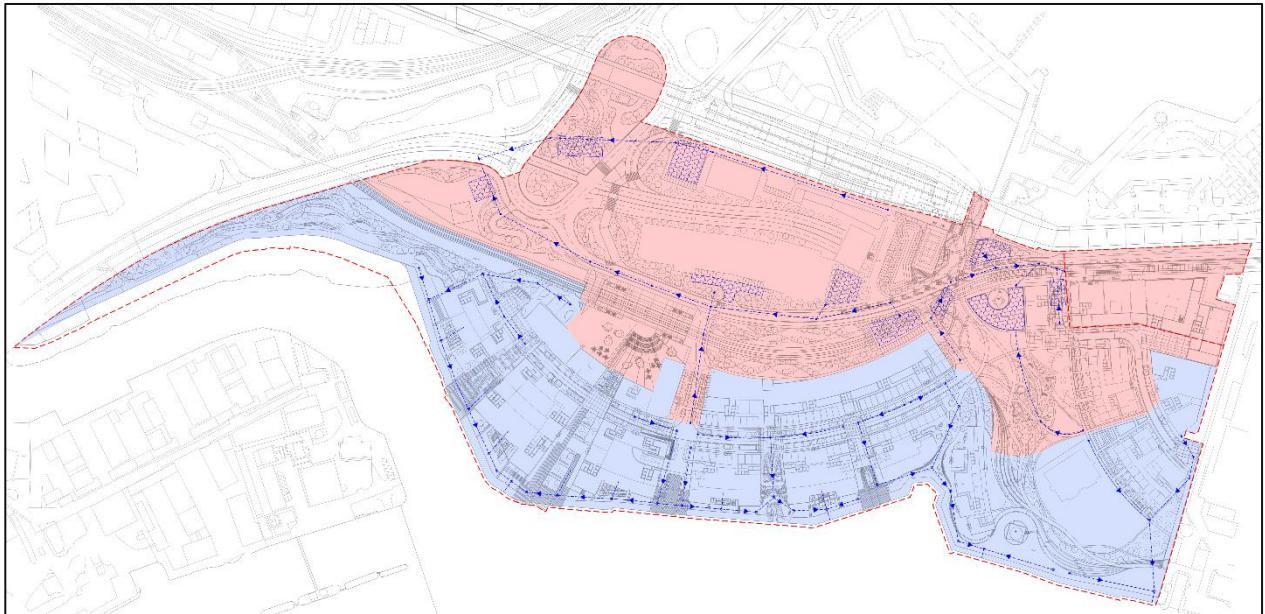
Plan showing the overall proposed surface water drainage strategy
